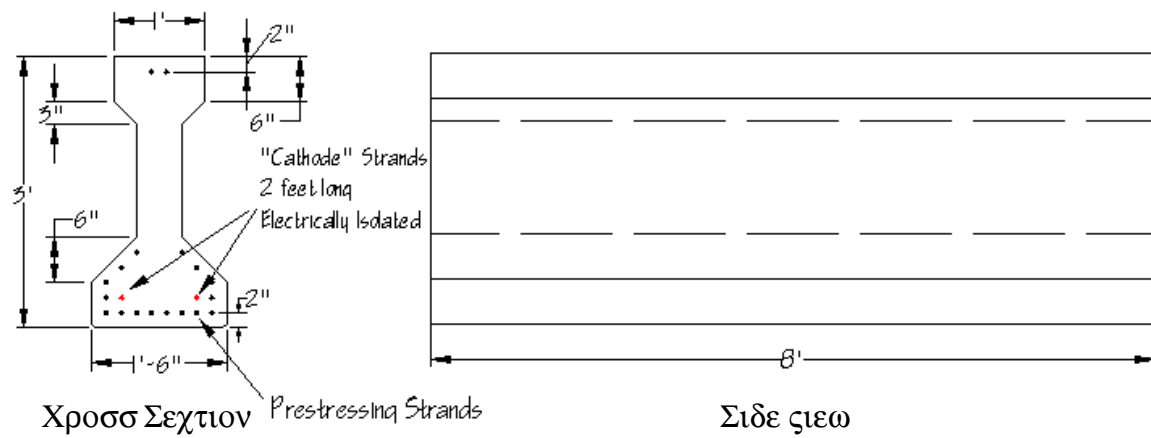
Design Details for Pretensioned Concrete Beam Specimens
